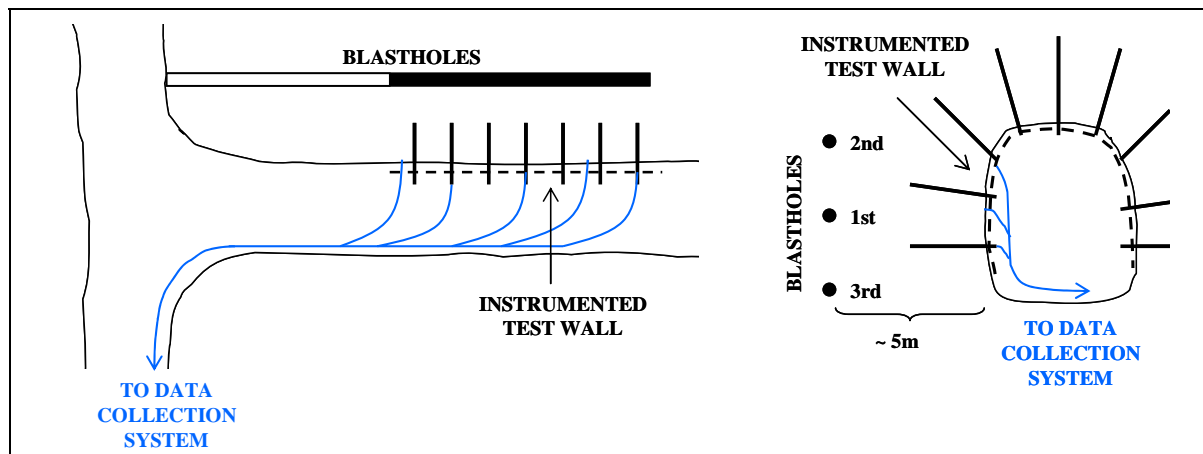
Conceptual plan and cross-sectional views of a simulated rockburst test site layout
